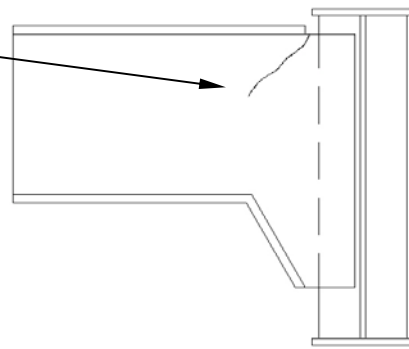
COMMON CRACK LOCATIONS AND TYPES IN CONCRETE STRUCTURES
